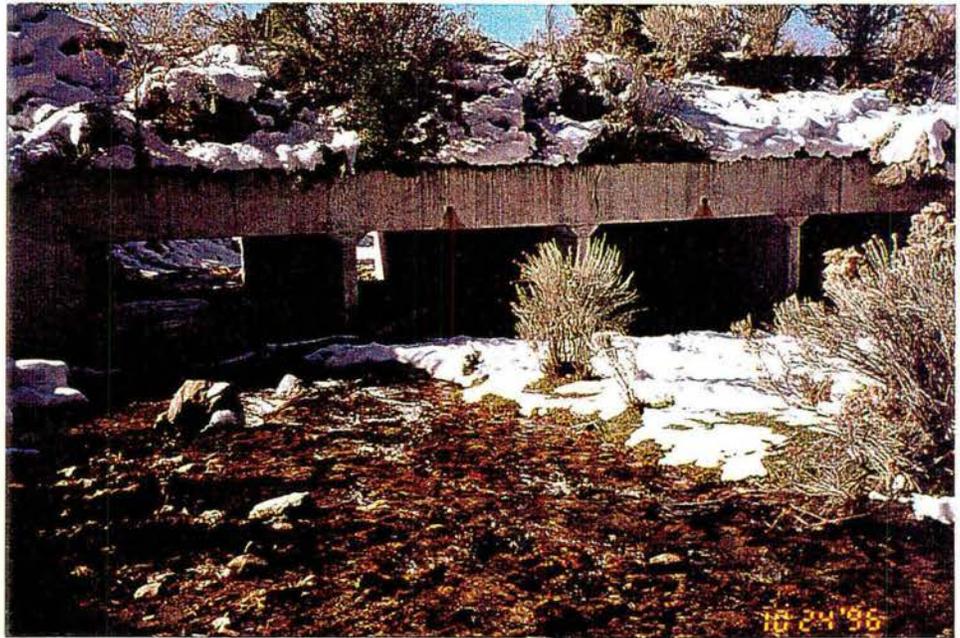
Box culverts about 625 ft upstream from Nambe Falls reservoir, looking downstream.
